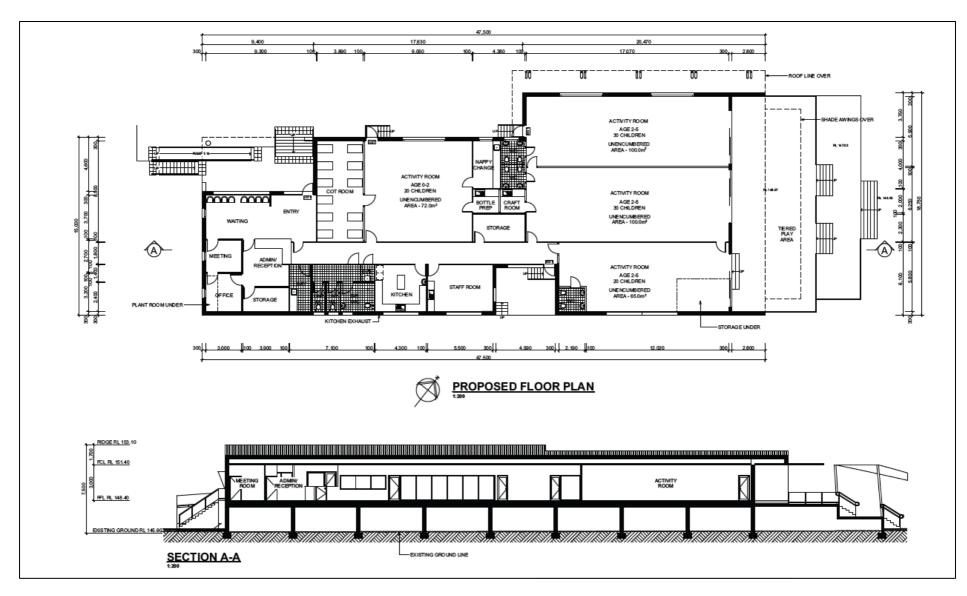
Floorplan and Section (Sorensen Design 2024)
